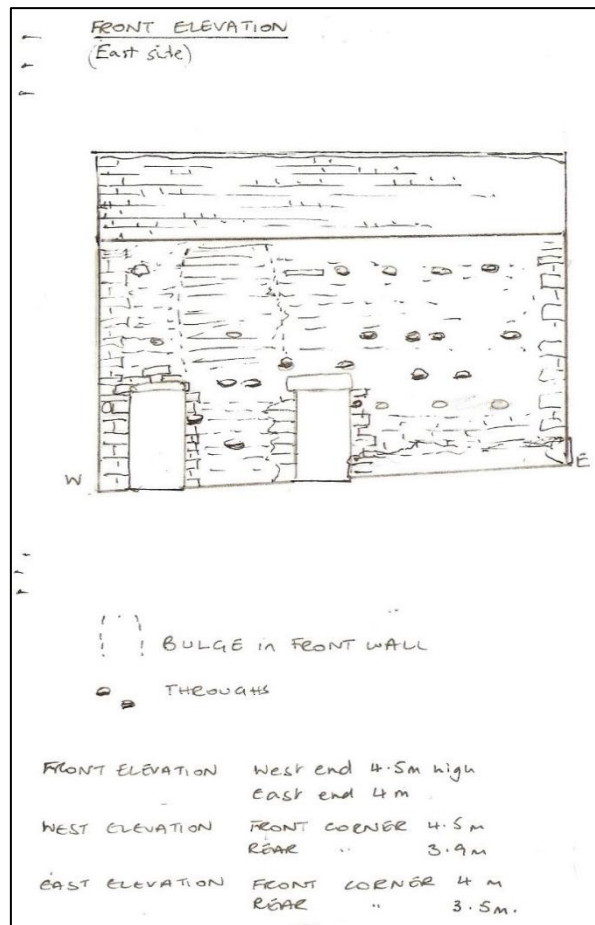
Thorns 6, east (front) elevation, 8m long
